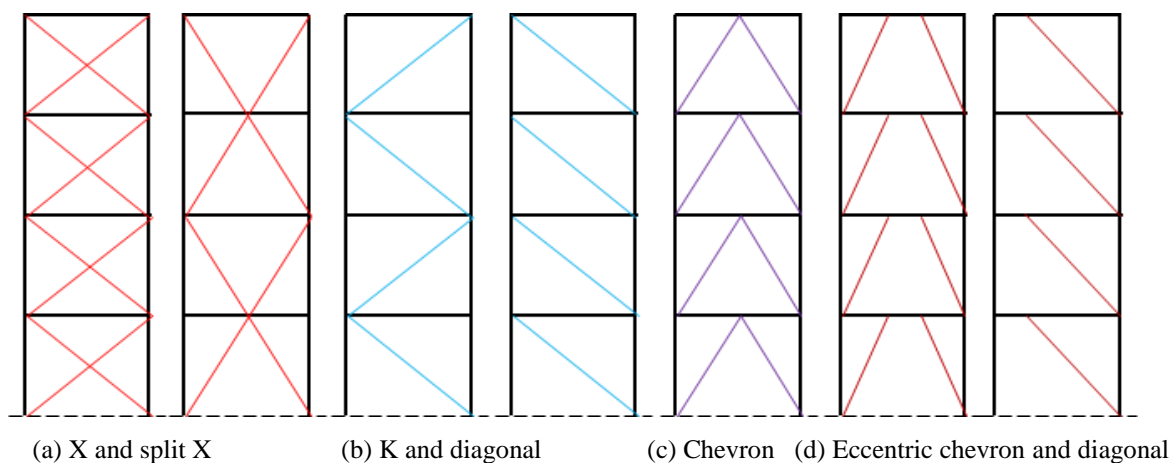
Typical layouts of concentric and eccentric brace configurations for a frame building
